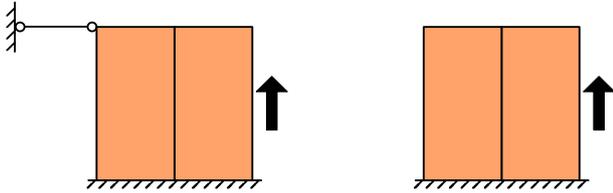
A simple distribution of forces, in a shear wall and a transverse wall, fulfilling the conditions of equilibrium.
